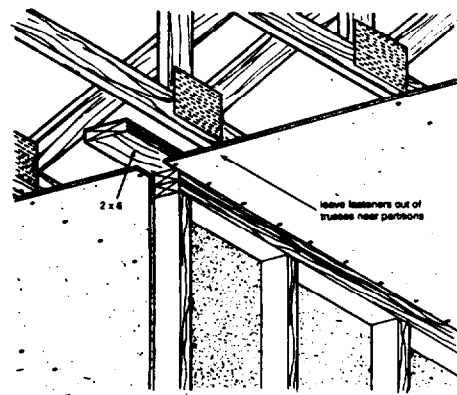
For trusses parallel to partitions, install 2 x 6 nailers for fastening ceiling materials. Leave fasteners out of trusses close to partitions.
